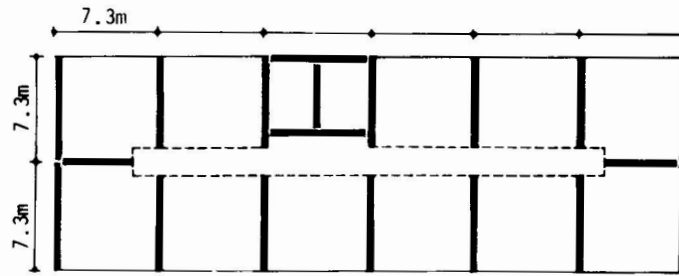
TYPICAL PANELIZED-APARTMENT BUILDING
